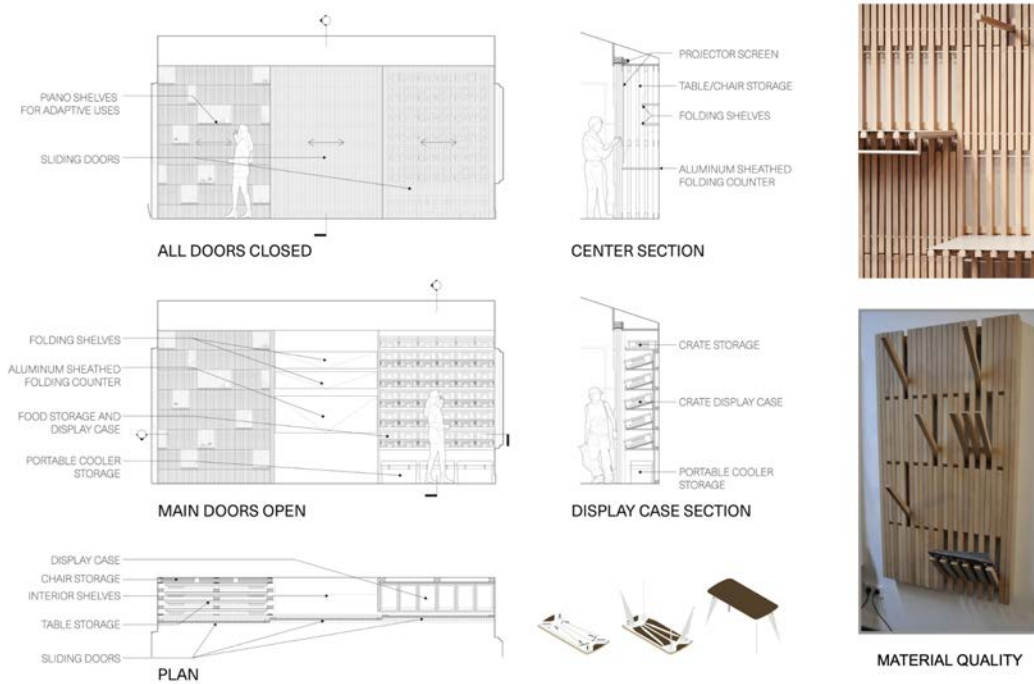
Group 3 proposal for north wall storage, drawn by Christopher Hauserman
